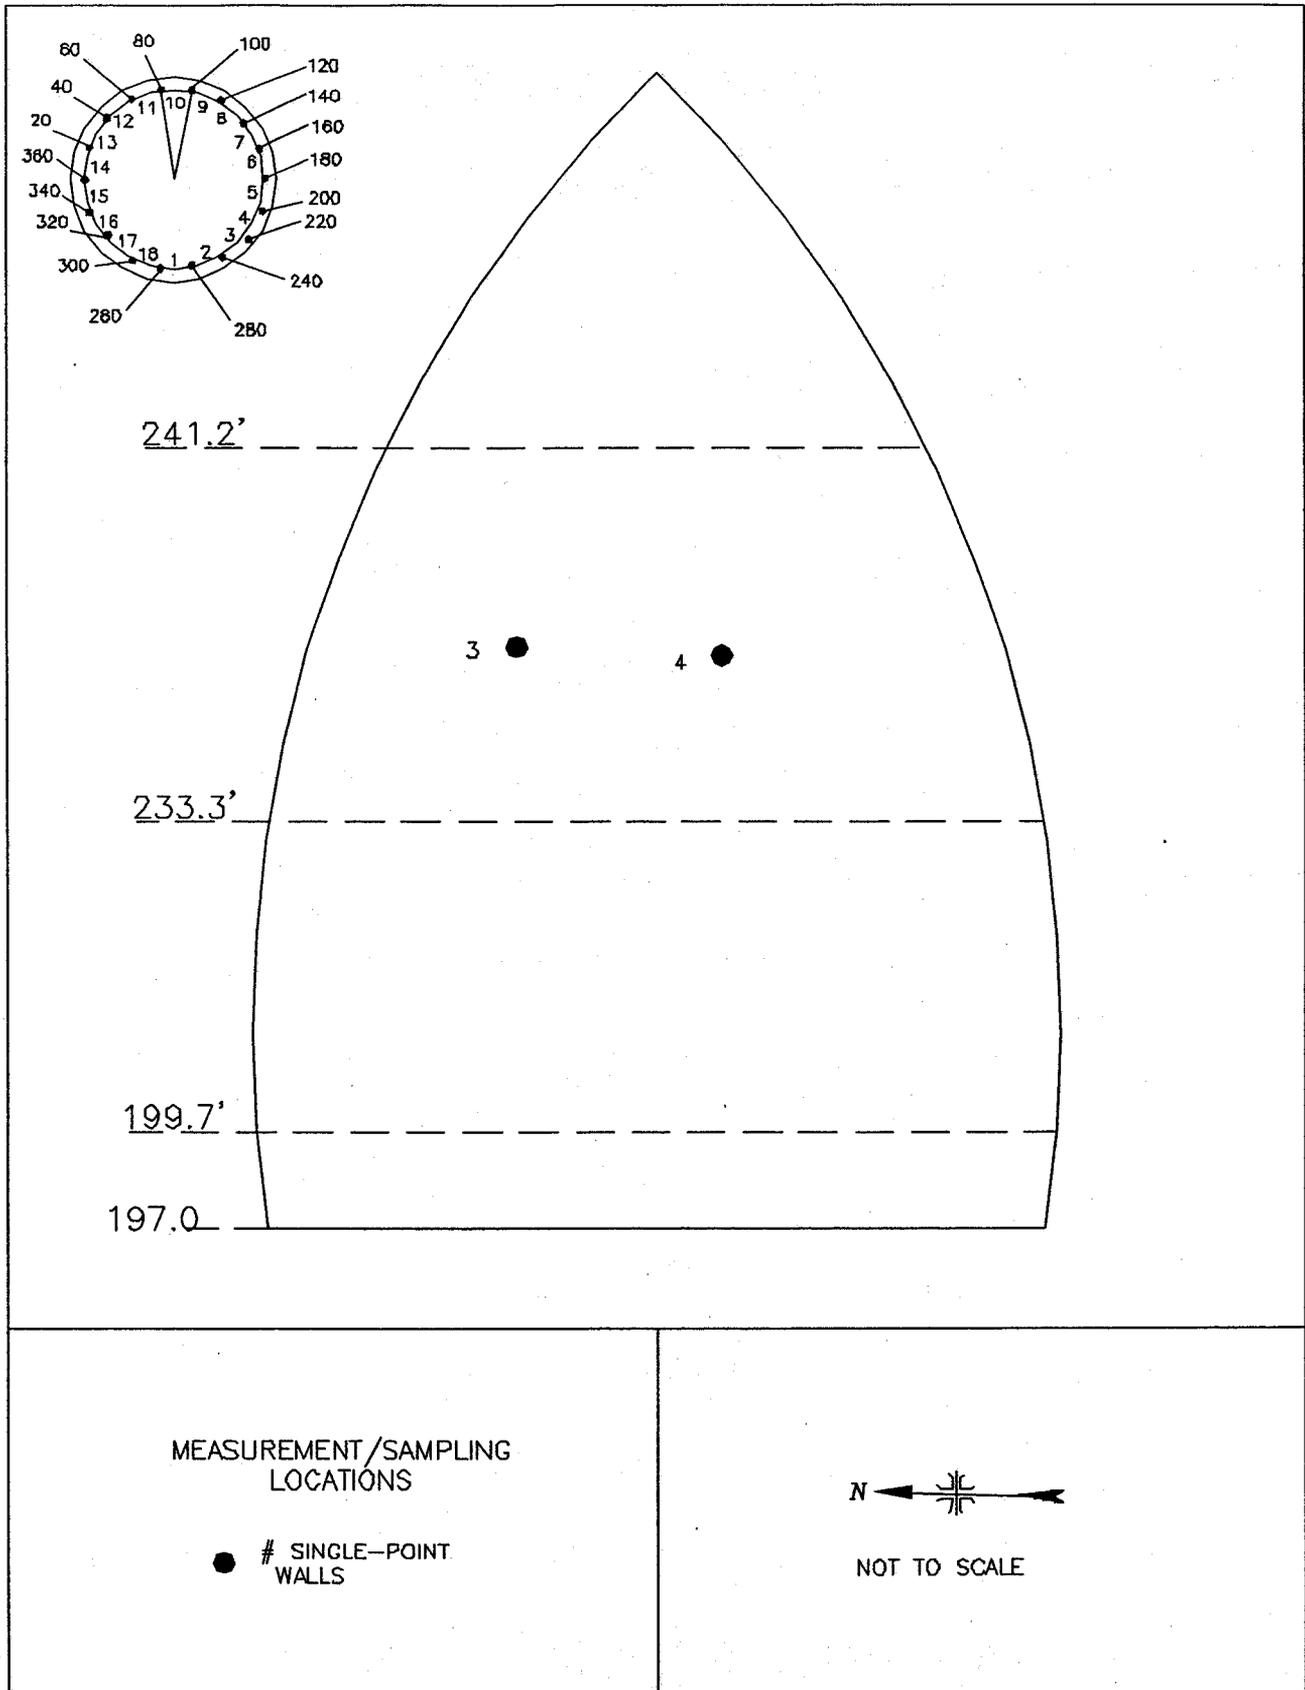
Containment Building Dome, Section 10 – Measurement and Sampling Locations
